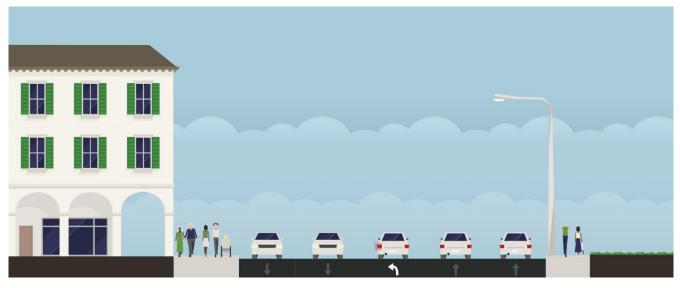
87 Avenue Facing East (West of 114 Street)
